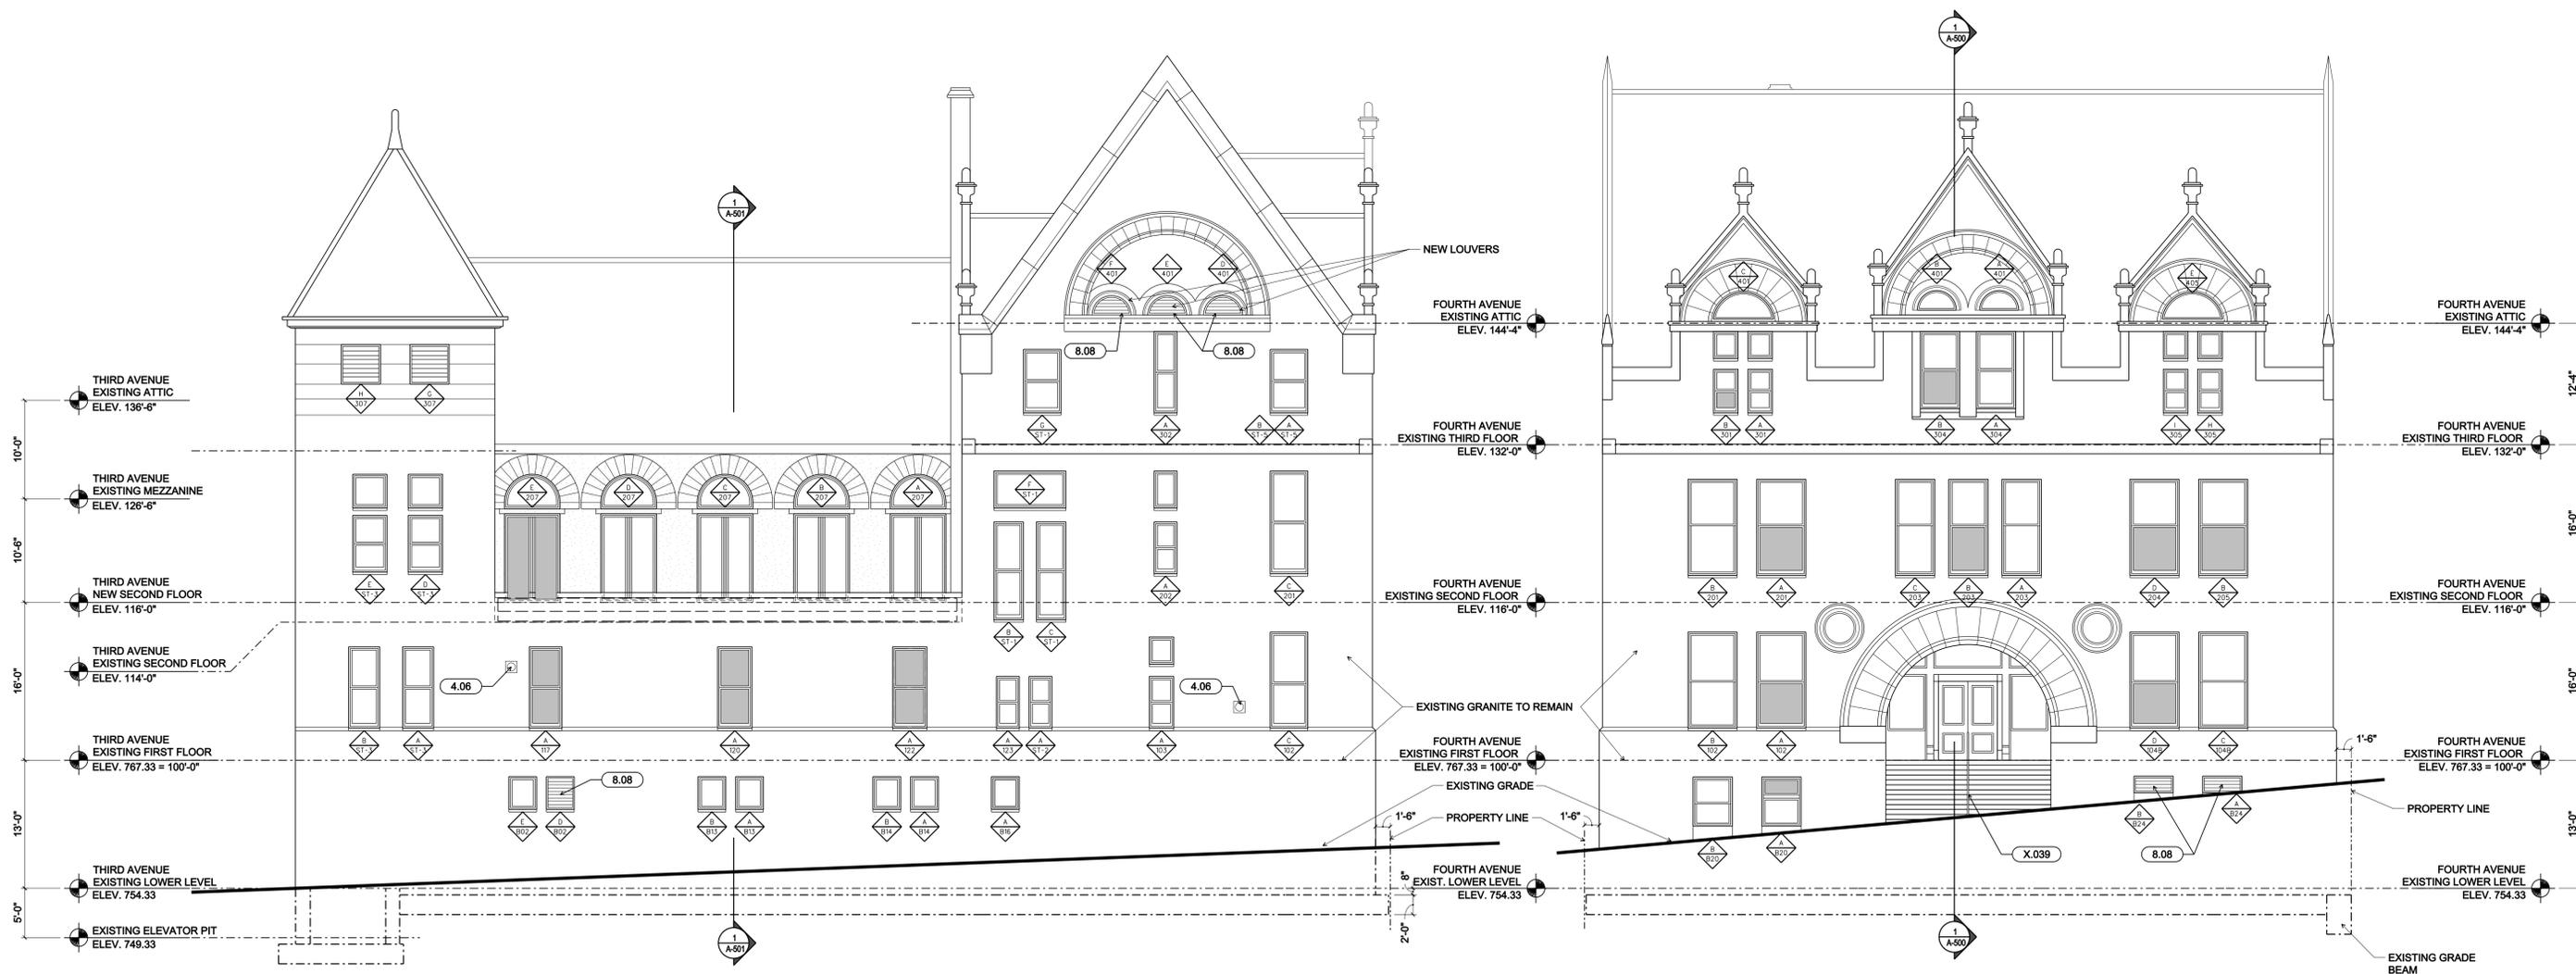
DETAILED DESCRIPTION OF PROPOSED WORK: Replacement of window units with glazing and replacement of some window units with louvers to accommodate new mechanical systems. Addition of door at Third Avenue elevation. Please see attached Exhibit A
